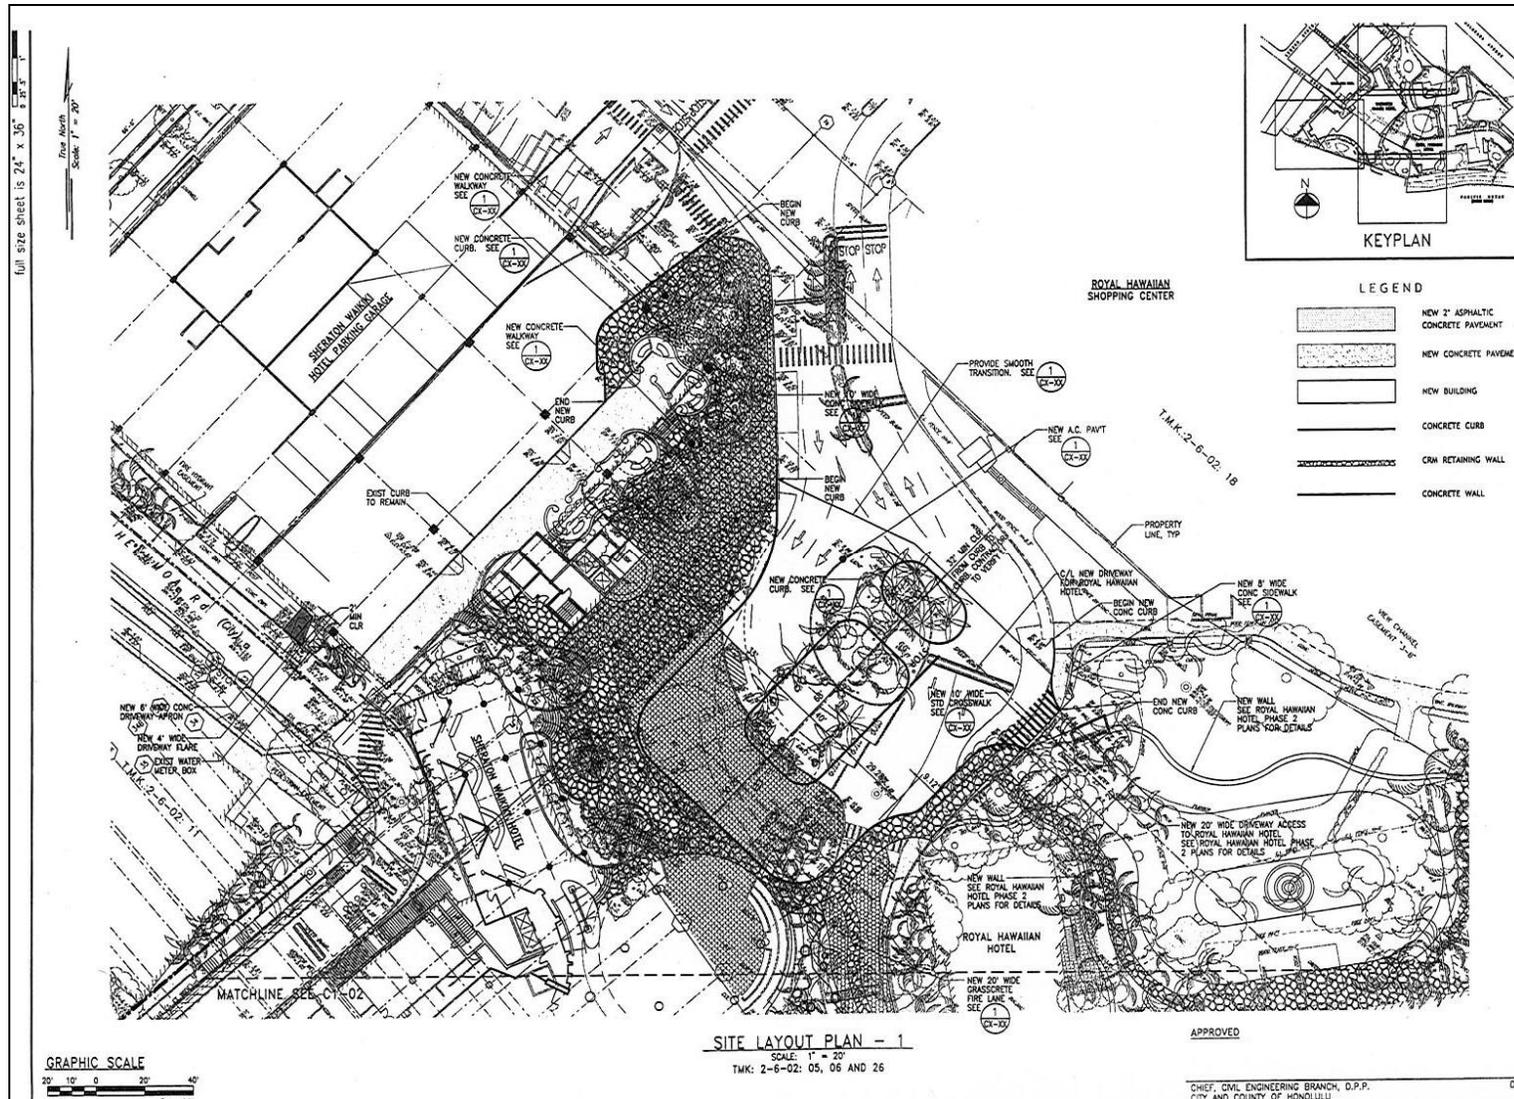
Renovation Site Layout Plan 1 showing re-working of the round-about in front of the Sheraton Waikiki entrance
